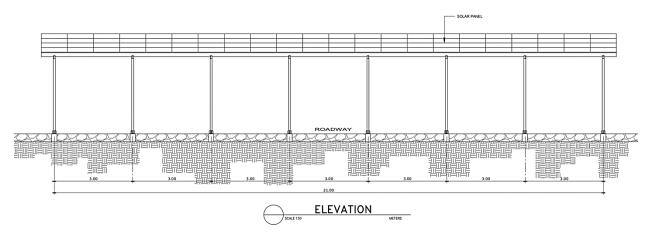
Elevation of the structure support for the ground mount solar installations.
